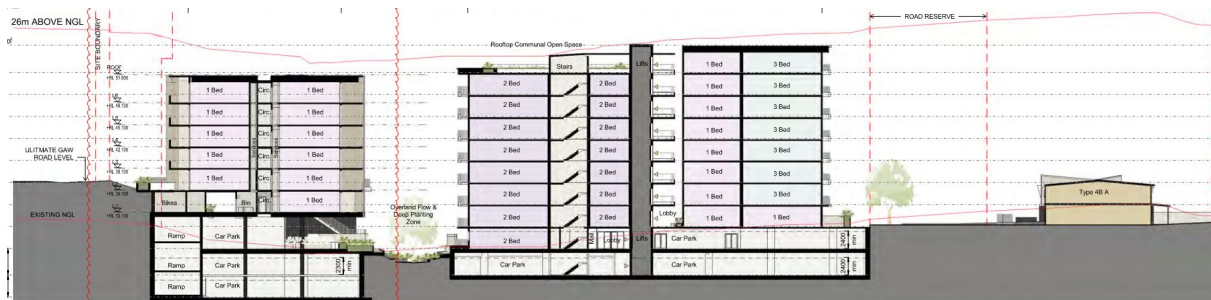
Section of Building 1 and Building 3 (Source: Archipelago)
